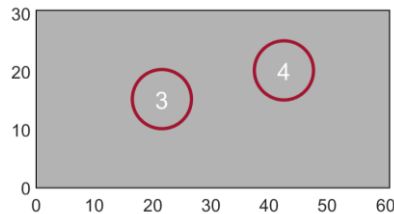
Core locations for the alkali-boosted unidirectionally reinforced concrete specimen (cm).
